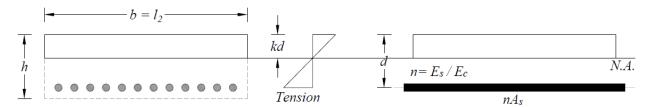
Cracked Transformed Section (Positive Moment Section)
